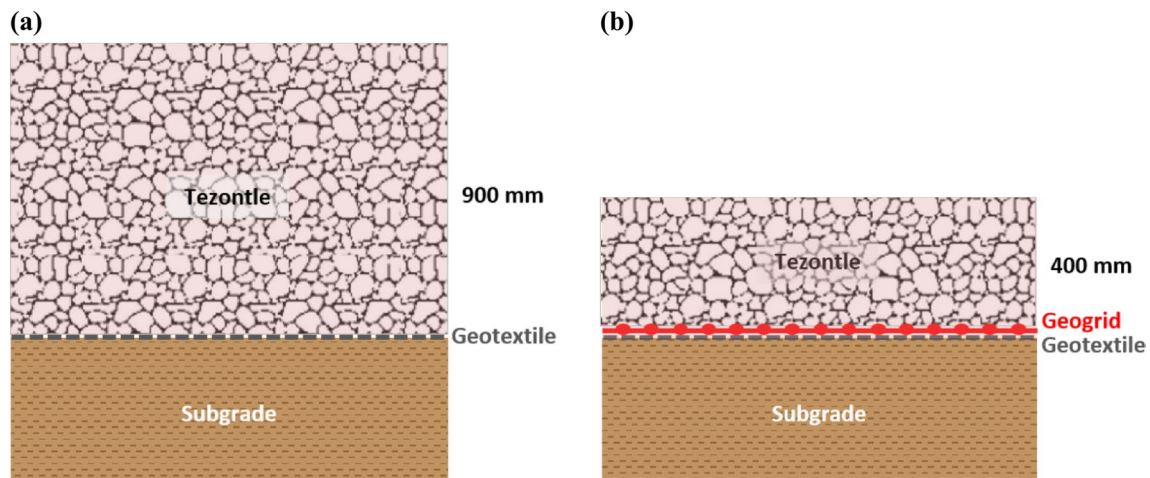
Cross-sections of the case study involving stabilization of soft subgrades: a Non-stabilized design section; b Geogrid-stabilized design section
